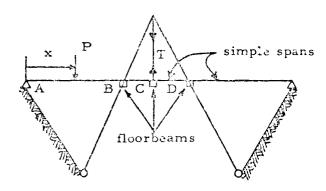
"A" FRAME BRIDGE, ELEVATION VIEW
